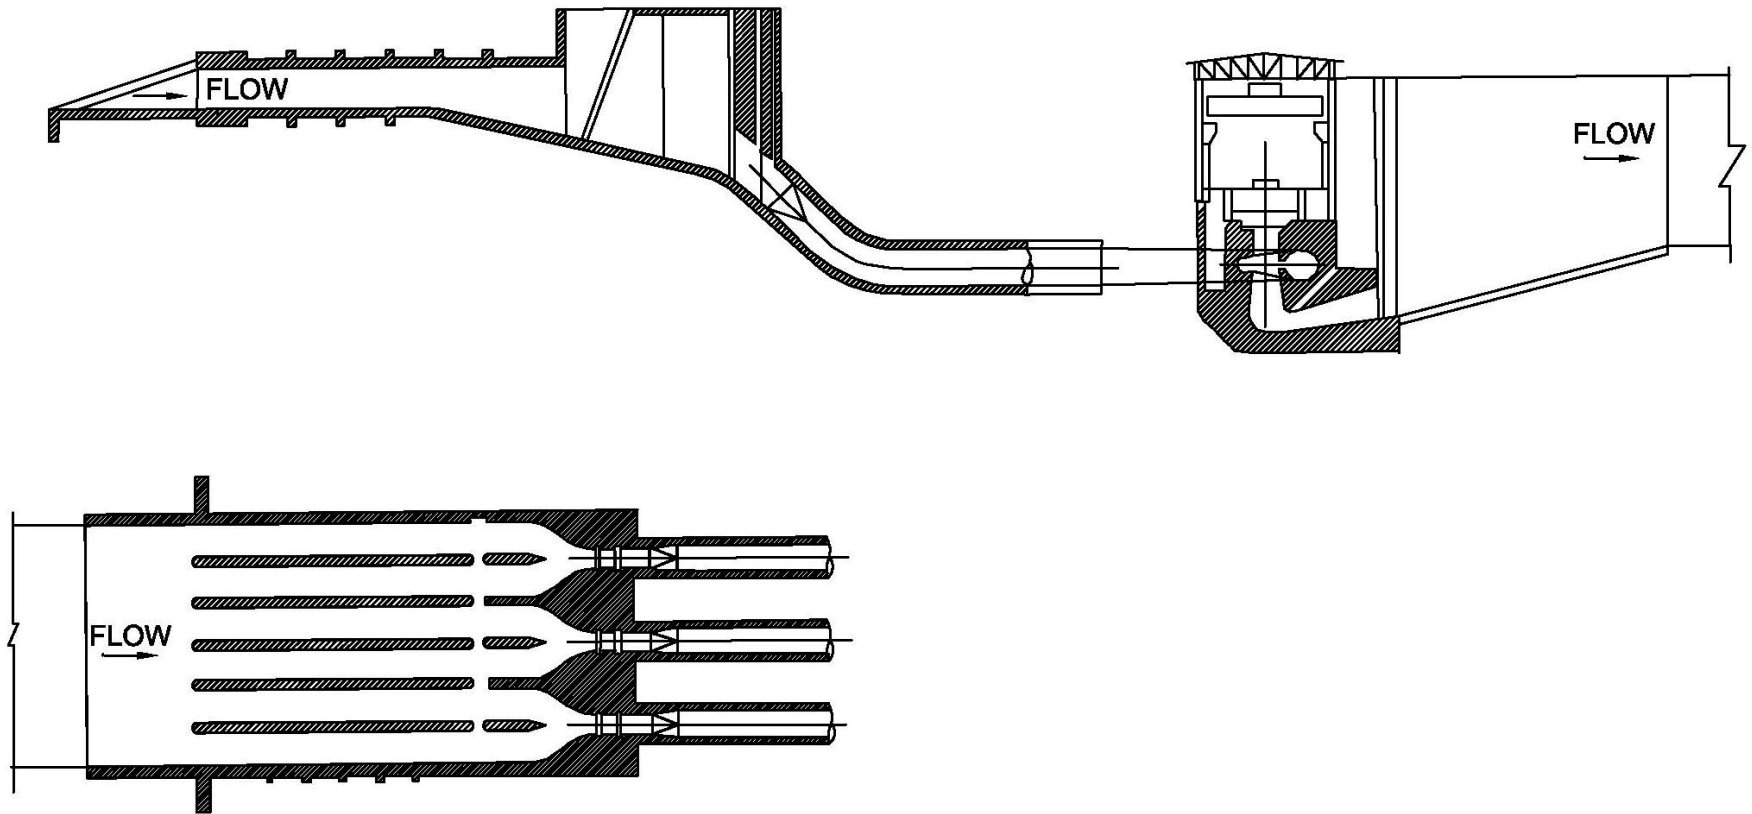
Typical Layout of SHP Using Abutment of an Existing Dam
